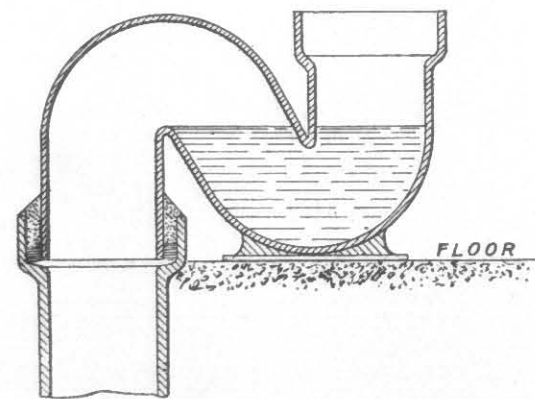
Connection of Earthenware Trap to Earthenware Drain.
